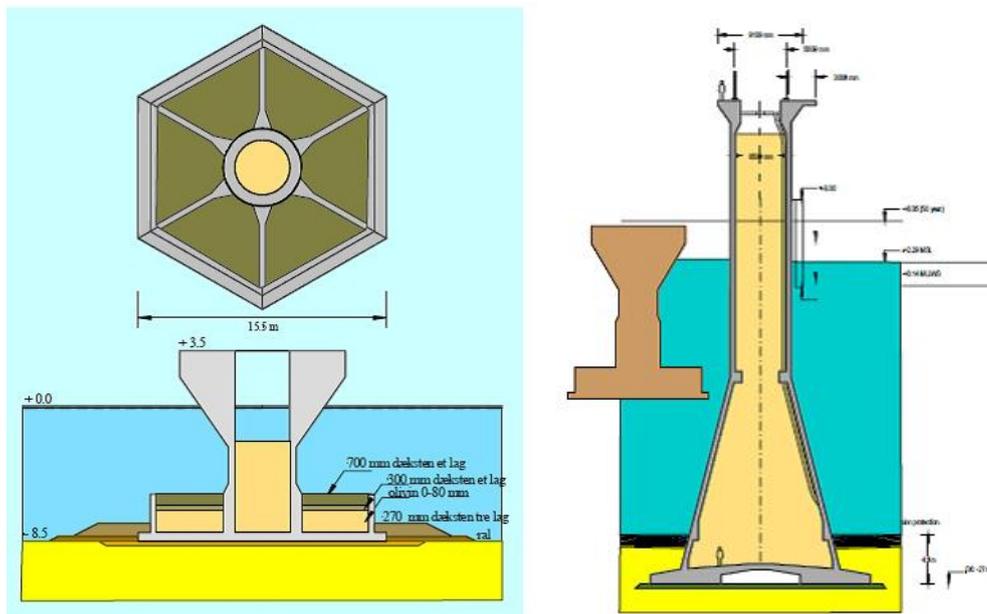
Schematic drawing of the gravity base foundation at the OWF *Nysted* (left side) and comparison of size of the foundation in *Nystedt* and *Thornton Bank* (right side) (source: THOMSEN et al. 2007)
